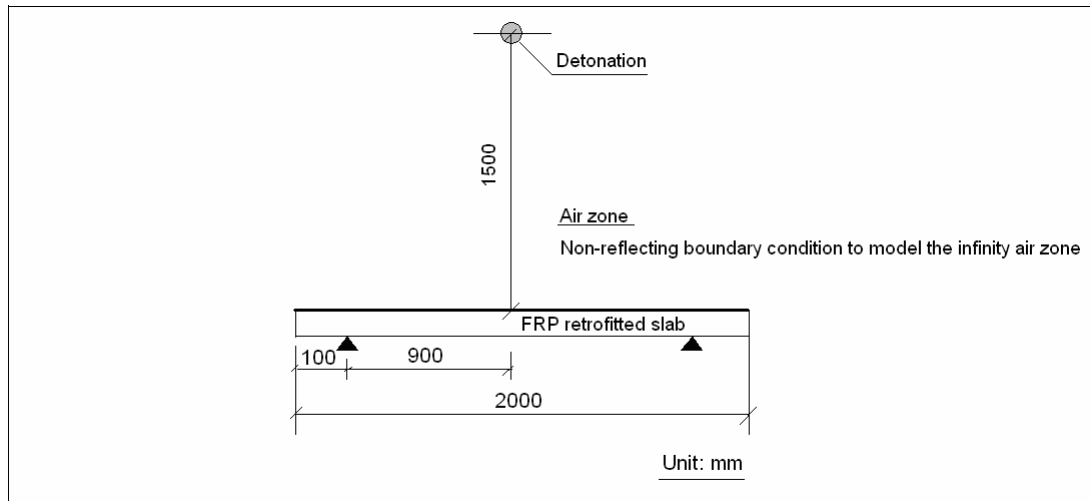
2D axial symmetric model sketch for FRP retrofitted concrete slab under blast load
